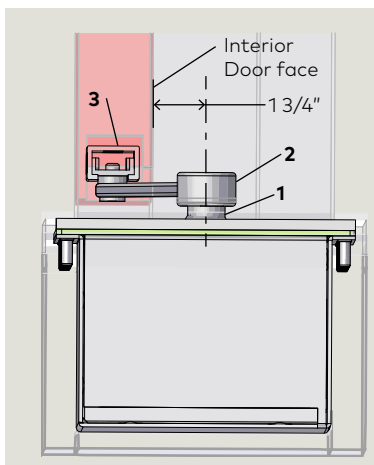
LH slide arm and track, alignment of spindle with door face front view
